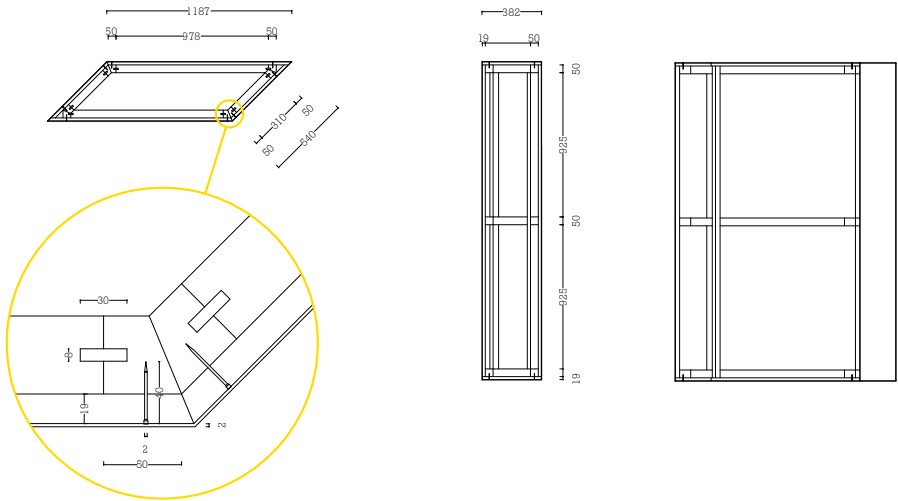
Construction detail - Internal panel joints | Axonometric view and dimensioned sections.
